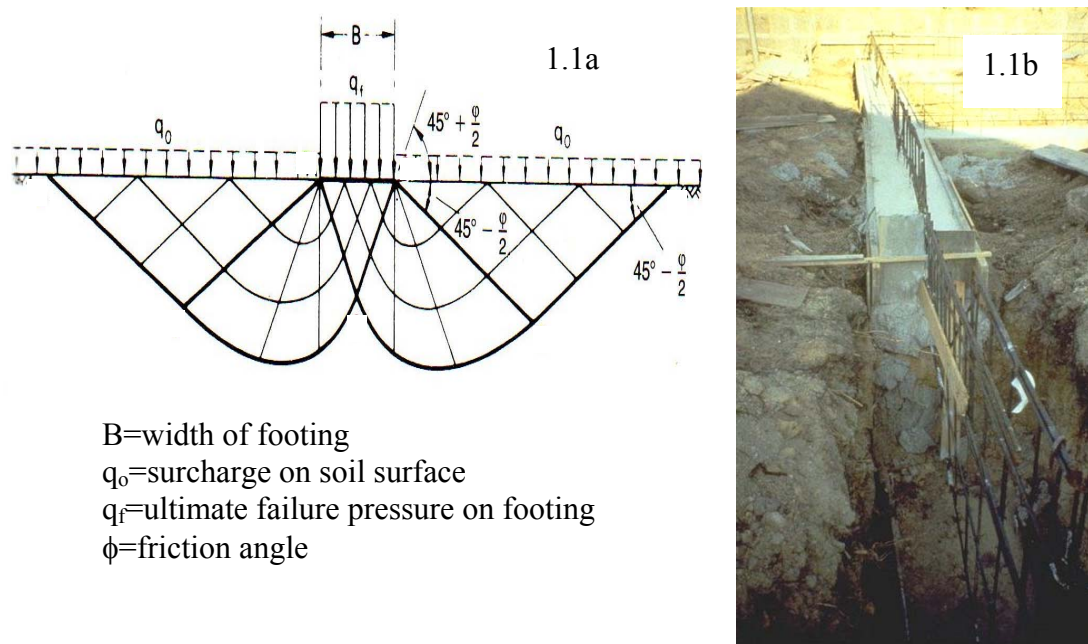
a: Typical failure mechanism for shallow footing (Craig, 1992)
